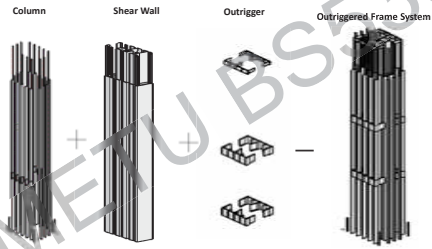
Structural System of Neva Tower 2 drawn by K. Buğra Taşçı ^[2]
